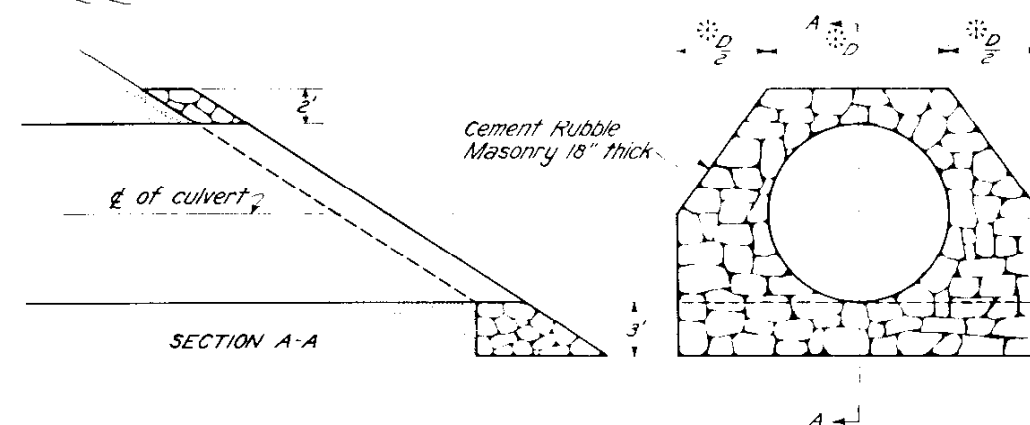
DETAILS AND LAYOUT FOR 135" MULTIPLE PLATE CULVERT AT STA. 269+60
